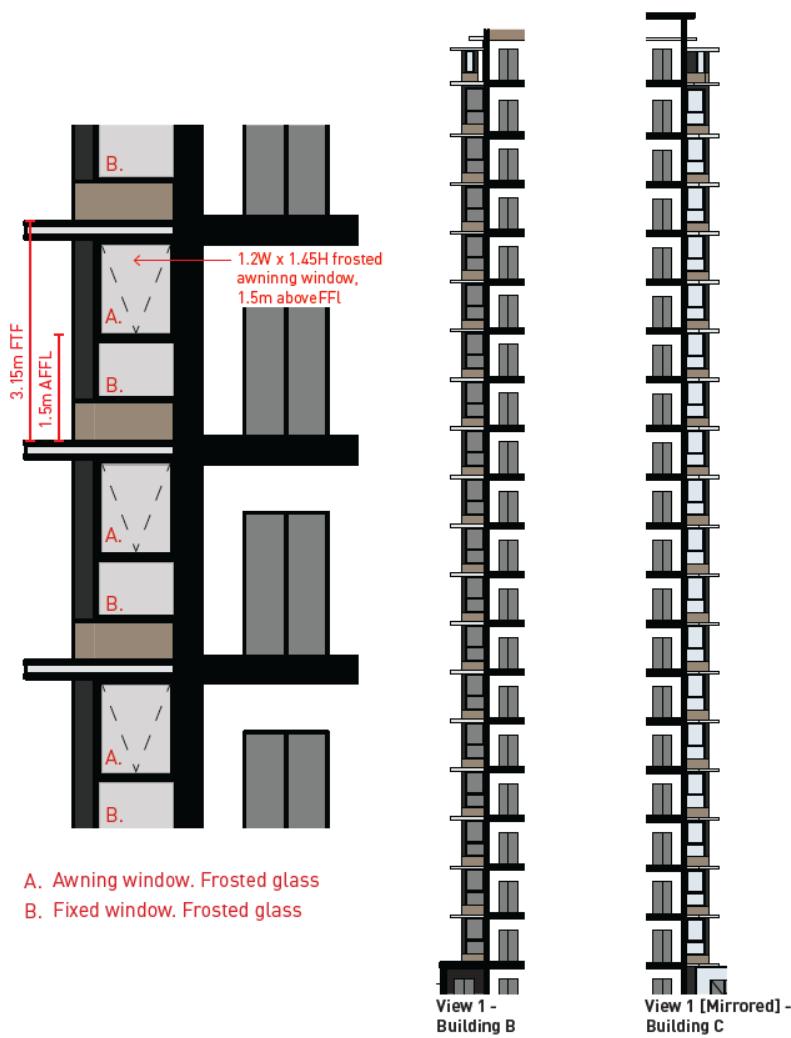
Cross ventilation diagram for Typical Unit B-09/C-01 (Source: PTW Architects)
